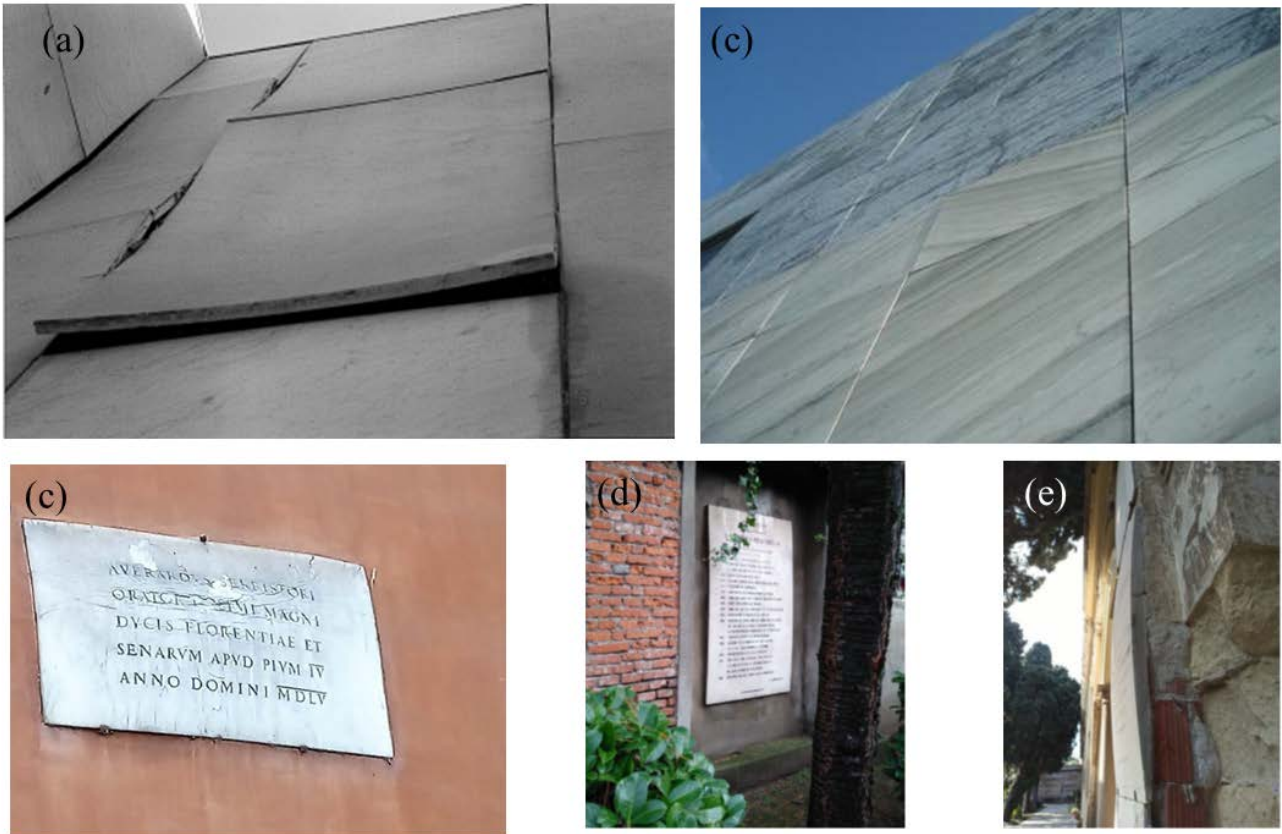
Examples of damaged marble slabs through bowing: (a) Alvar Aalto's Finland Hall clad with Carrara marble slabs (Helsinki, Finland) (Royer-Carfagni, 1999); (b) Vatican City cross road (Vatican State); (c) Marble Façade depicting bowing, (Lisbon, Portugal); (d) Porta Vicentina building (Milan, Italy); (e) Bonaria monumental cemetery (Cagliari, Italy). Photos by authors.
